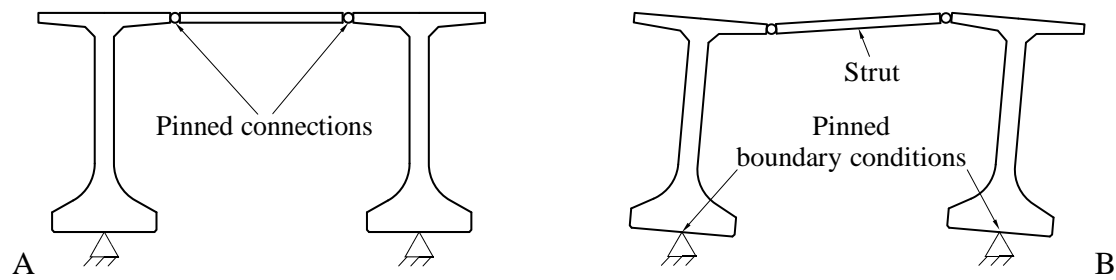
Collapse mechanism possible with strut bracing. A) Undeformed configuration. B) Collapse mechanism.
